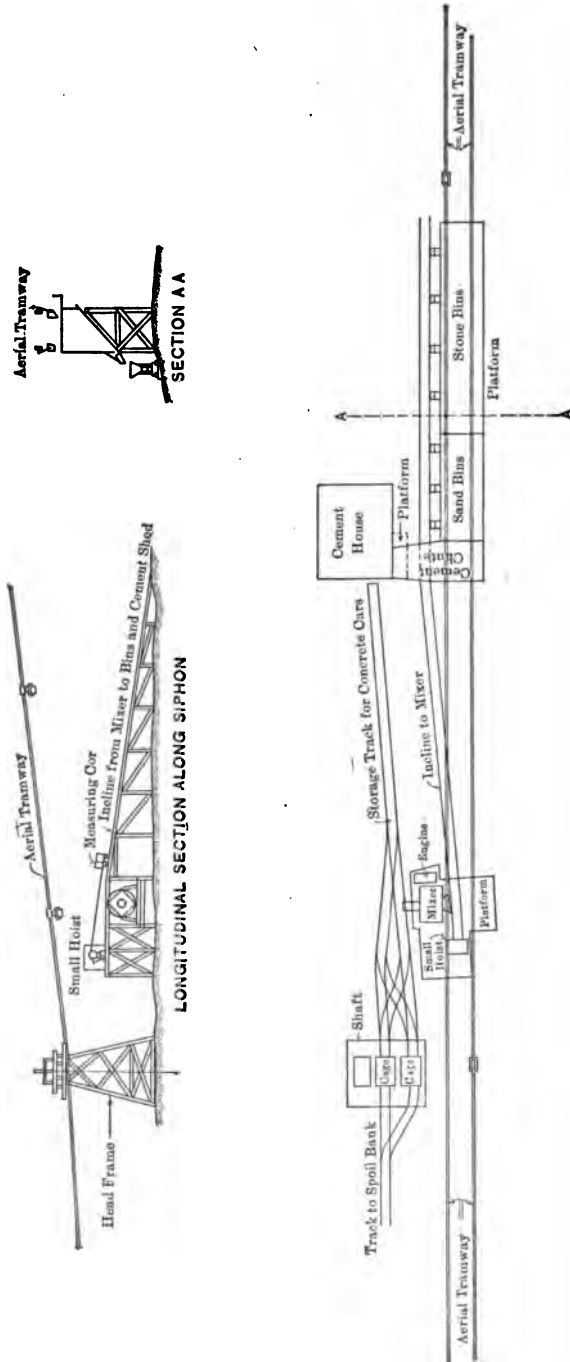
Rondout Siphon. Roebling Aerial Tramway Used to Transport Cement, Sand, and Stone between Shafts 5, 4, 3, and 2. Arrangements of bins and concrete plant at shafts.
